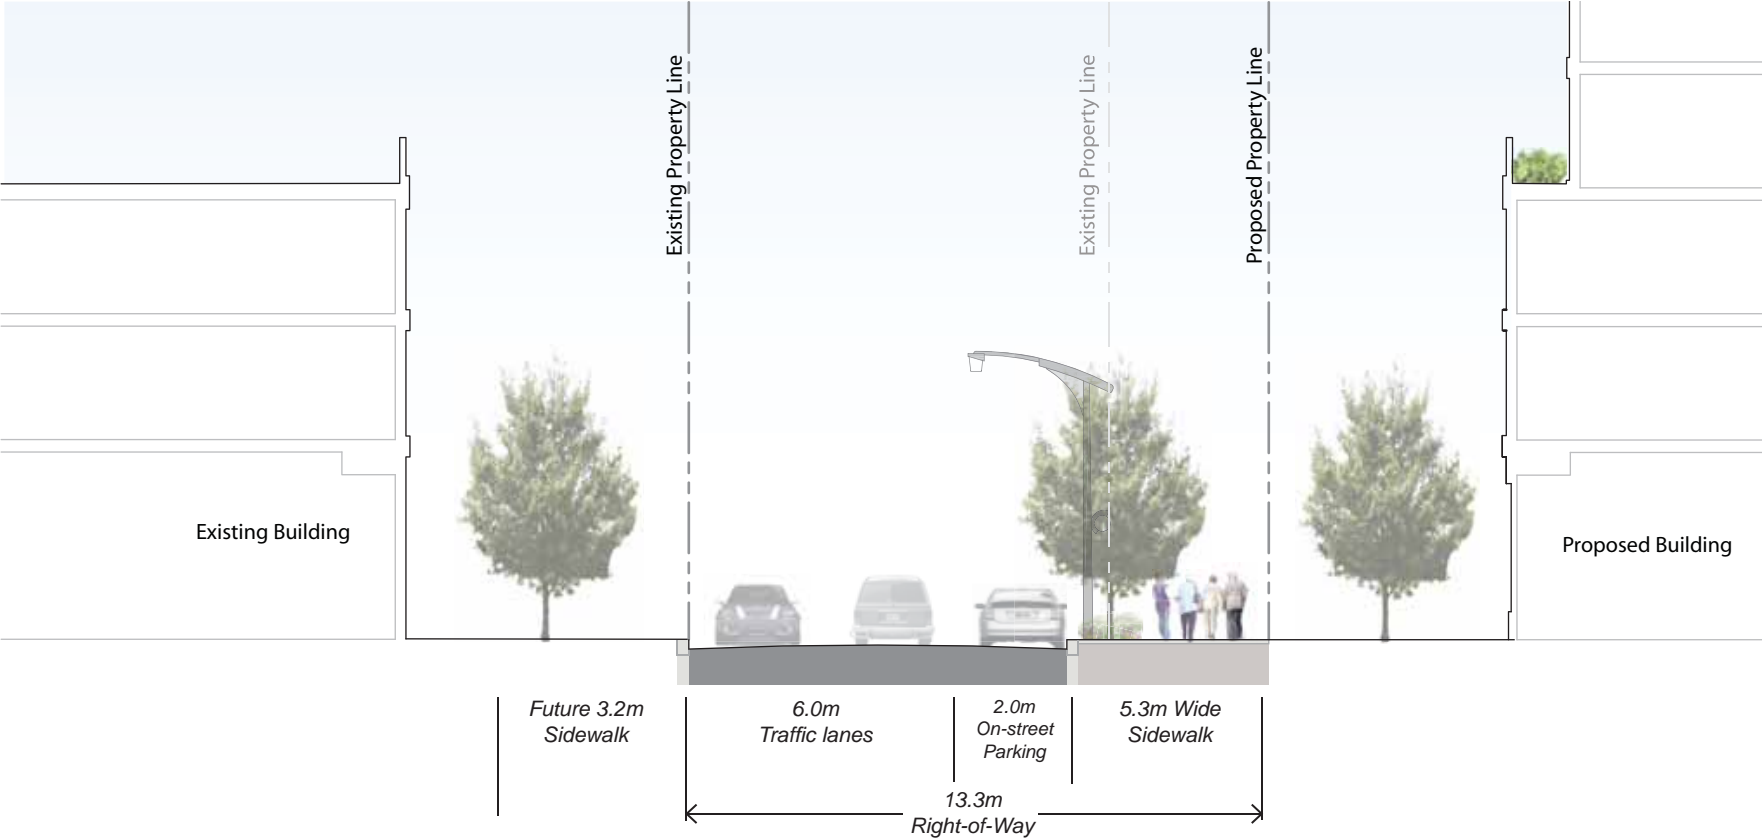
Proposed Upgraded Pell Street Lane Typical Section
